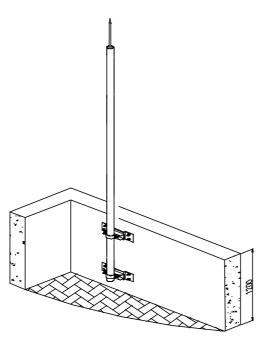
Antenna support fixed on parapet (with parapet not shorter than 1200mm)
